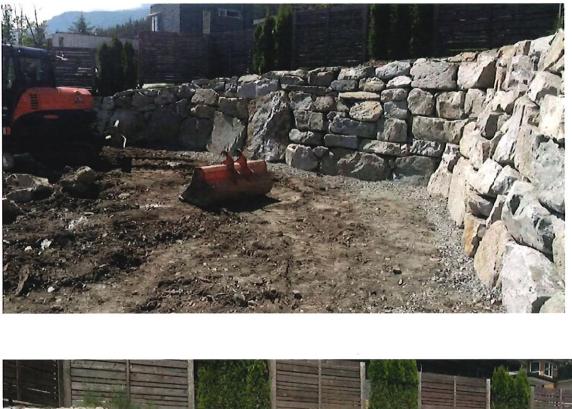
Rear yard slope and proposed retaining walls (looking west from marine shoreline)
